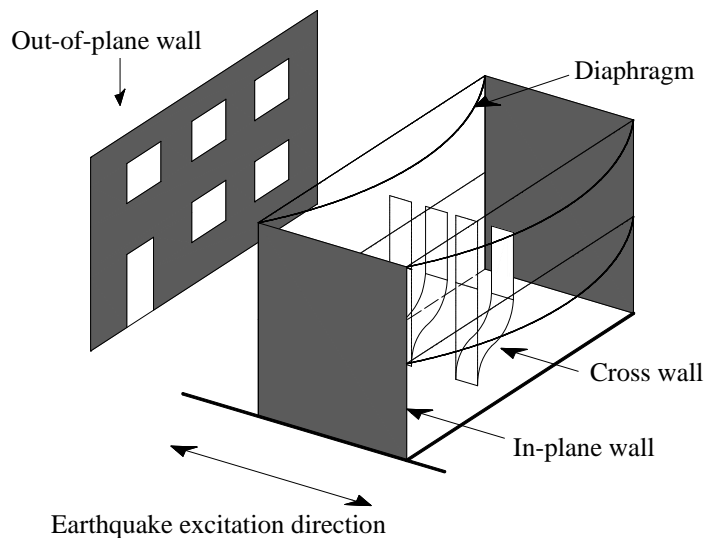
Scheme of a typical masonry building under earthquake excitation (adapted from Moon 2004).
